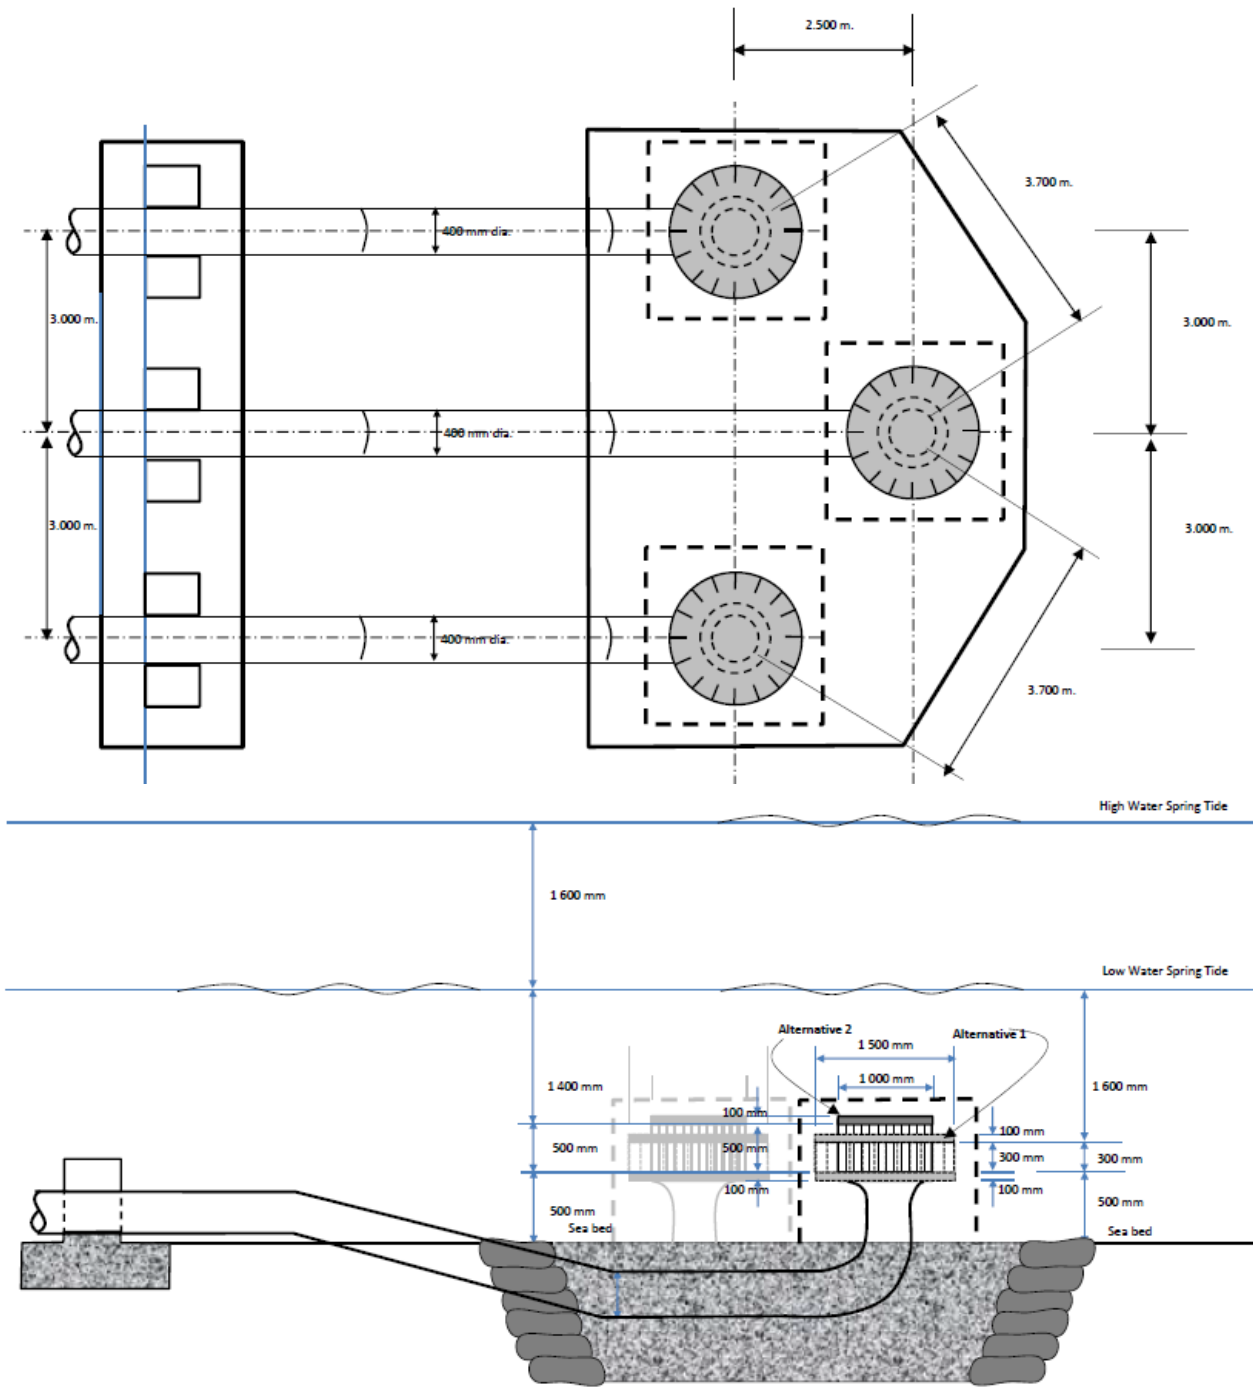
Top – longitudinal section of concept Gully Intake Works. Bottom – cross section through concept Gully Intake Works (Source: Bergstan Africa, 2013).
